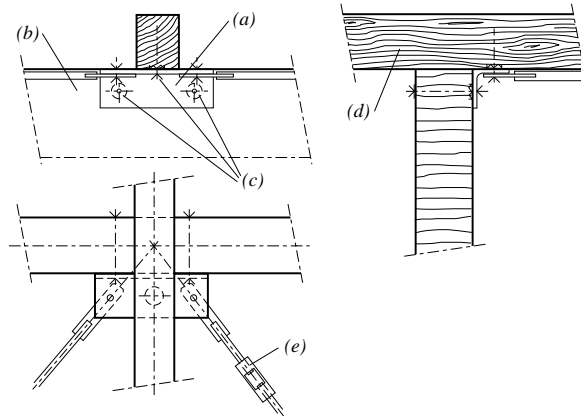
Connection of steel diagonals with angle brackets and flat bars. (a) Angle bracket, (b) braced beam, (c) fastener, (d) purlin, (e) turnbuckle. (STEP 1995 Article D9)
